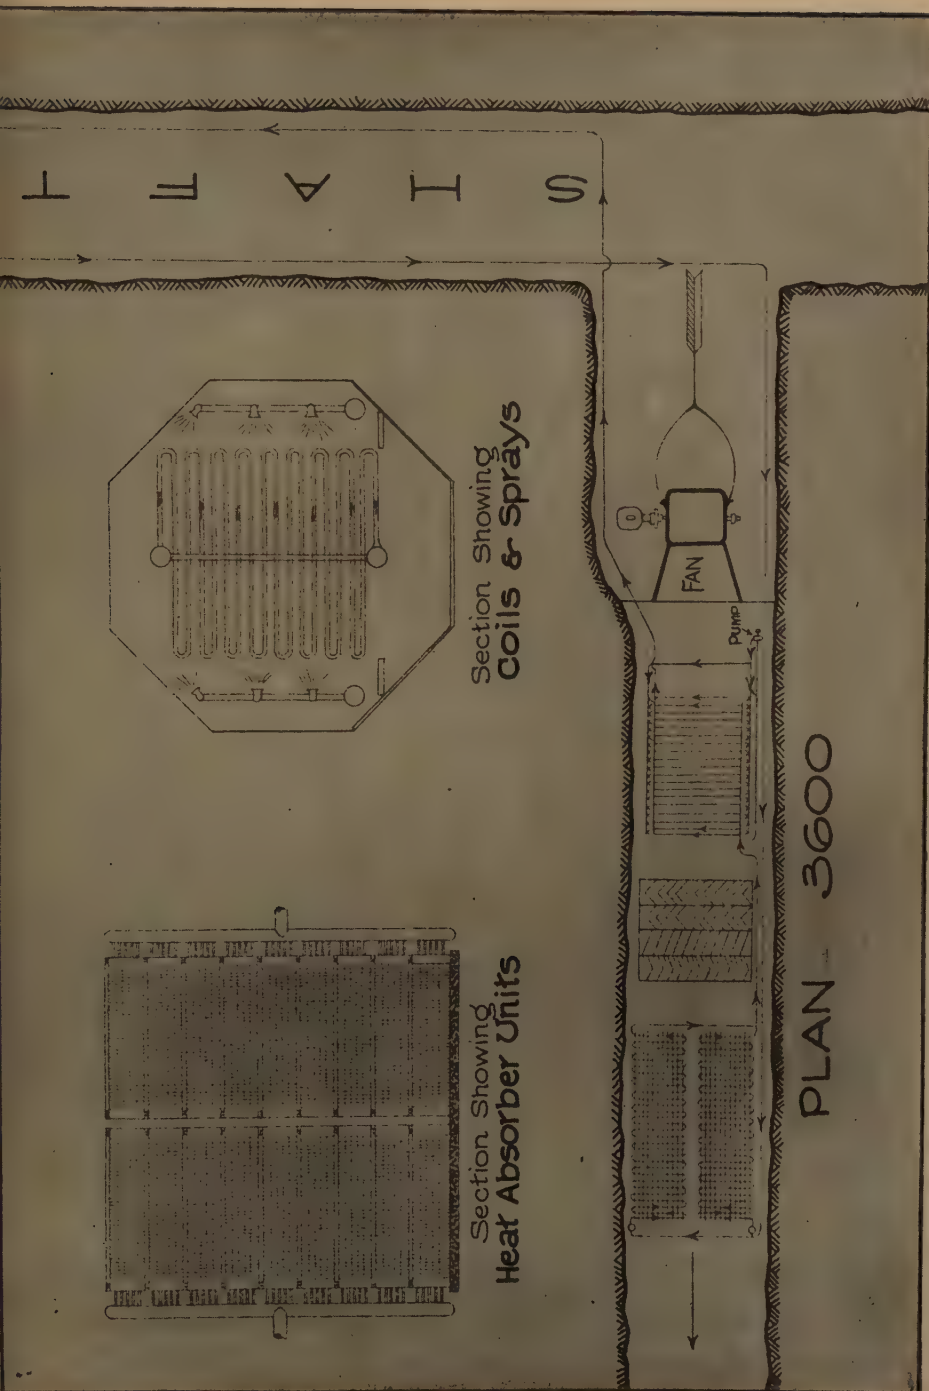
AIR-CONDITIONING PLANT ON 3600-FOOT LEVEL.
